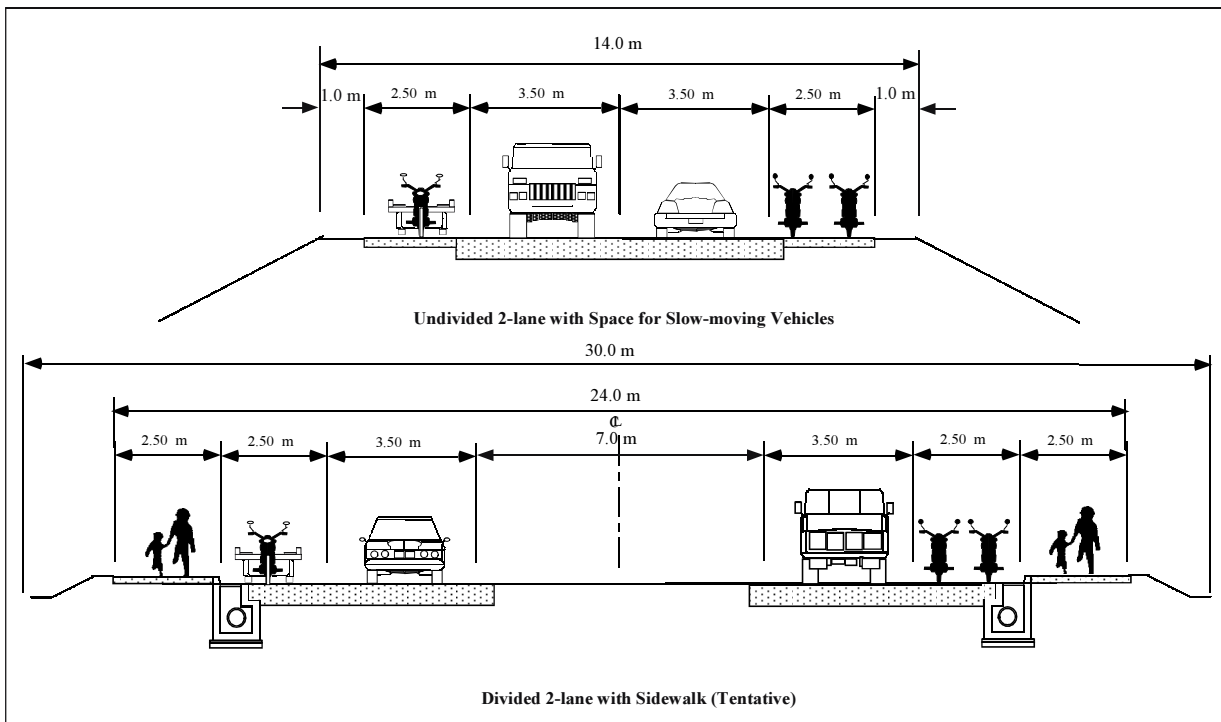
Typical Cross Section to keep Space for Safety Measures and Future Widening
